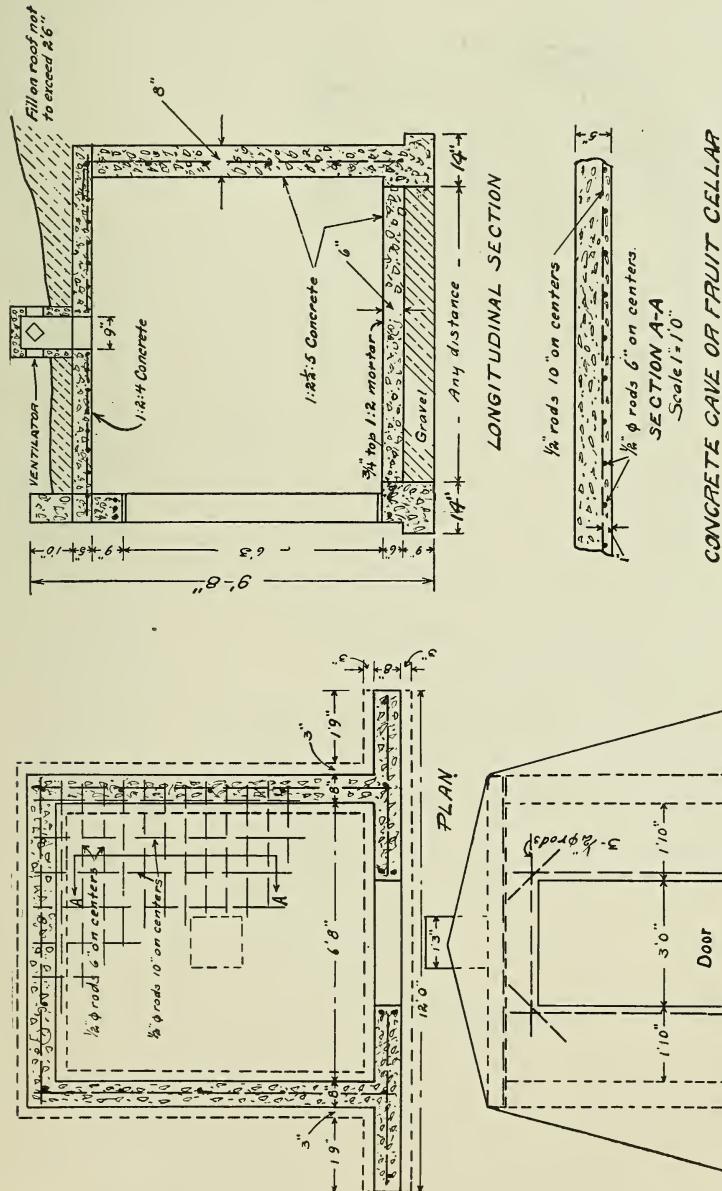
Plan and Elevation of a Flat Top Reinforced Concrete Root Cellar.
